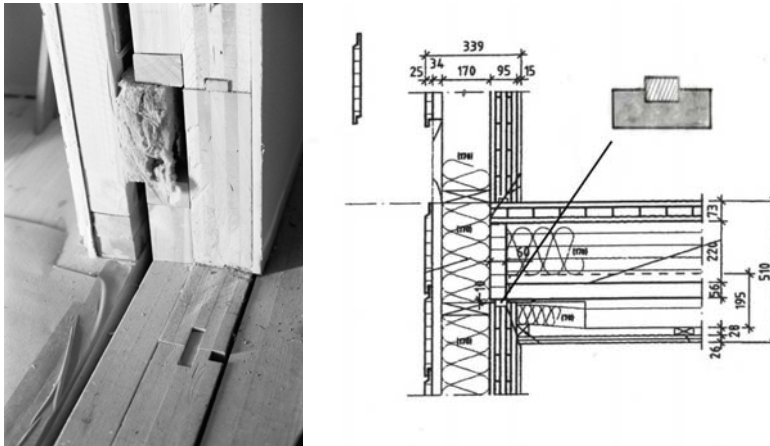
Wall section of an apartment dividing partition wall between an apartment and the staircase during construction and vertical section at wall-floor joint-zone. A separate board is placed on site to cover the horizontal element joints.
